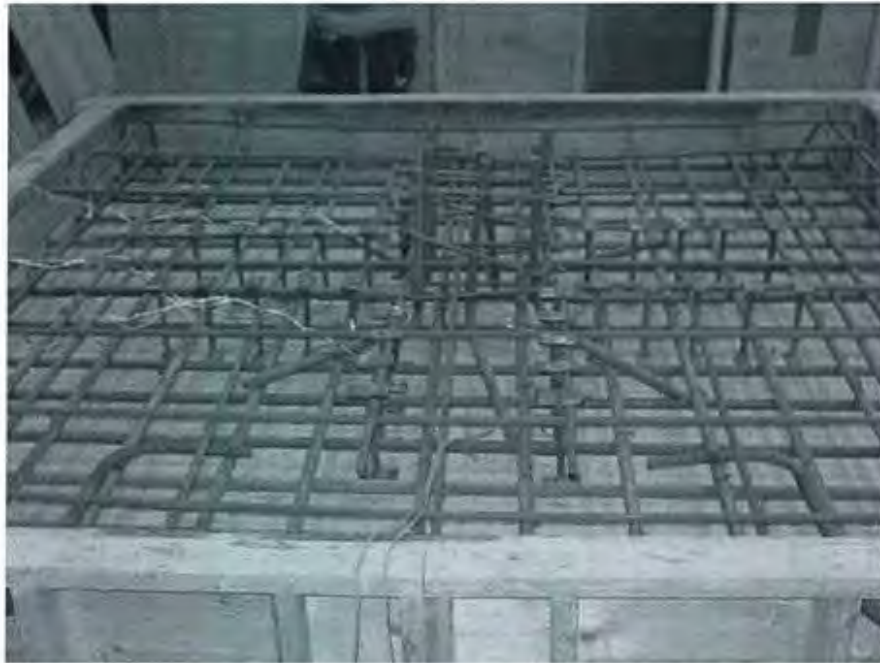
A reinforcement cage in the formwork for slab HS5 with T-headed shear stud reinforcement ( $h = 300$  mm)
